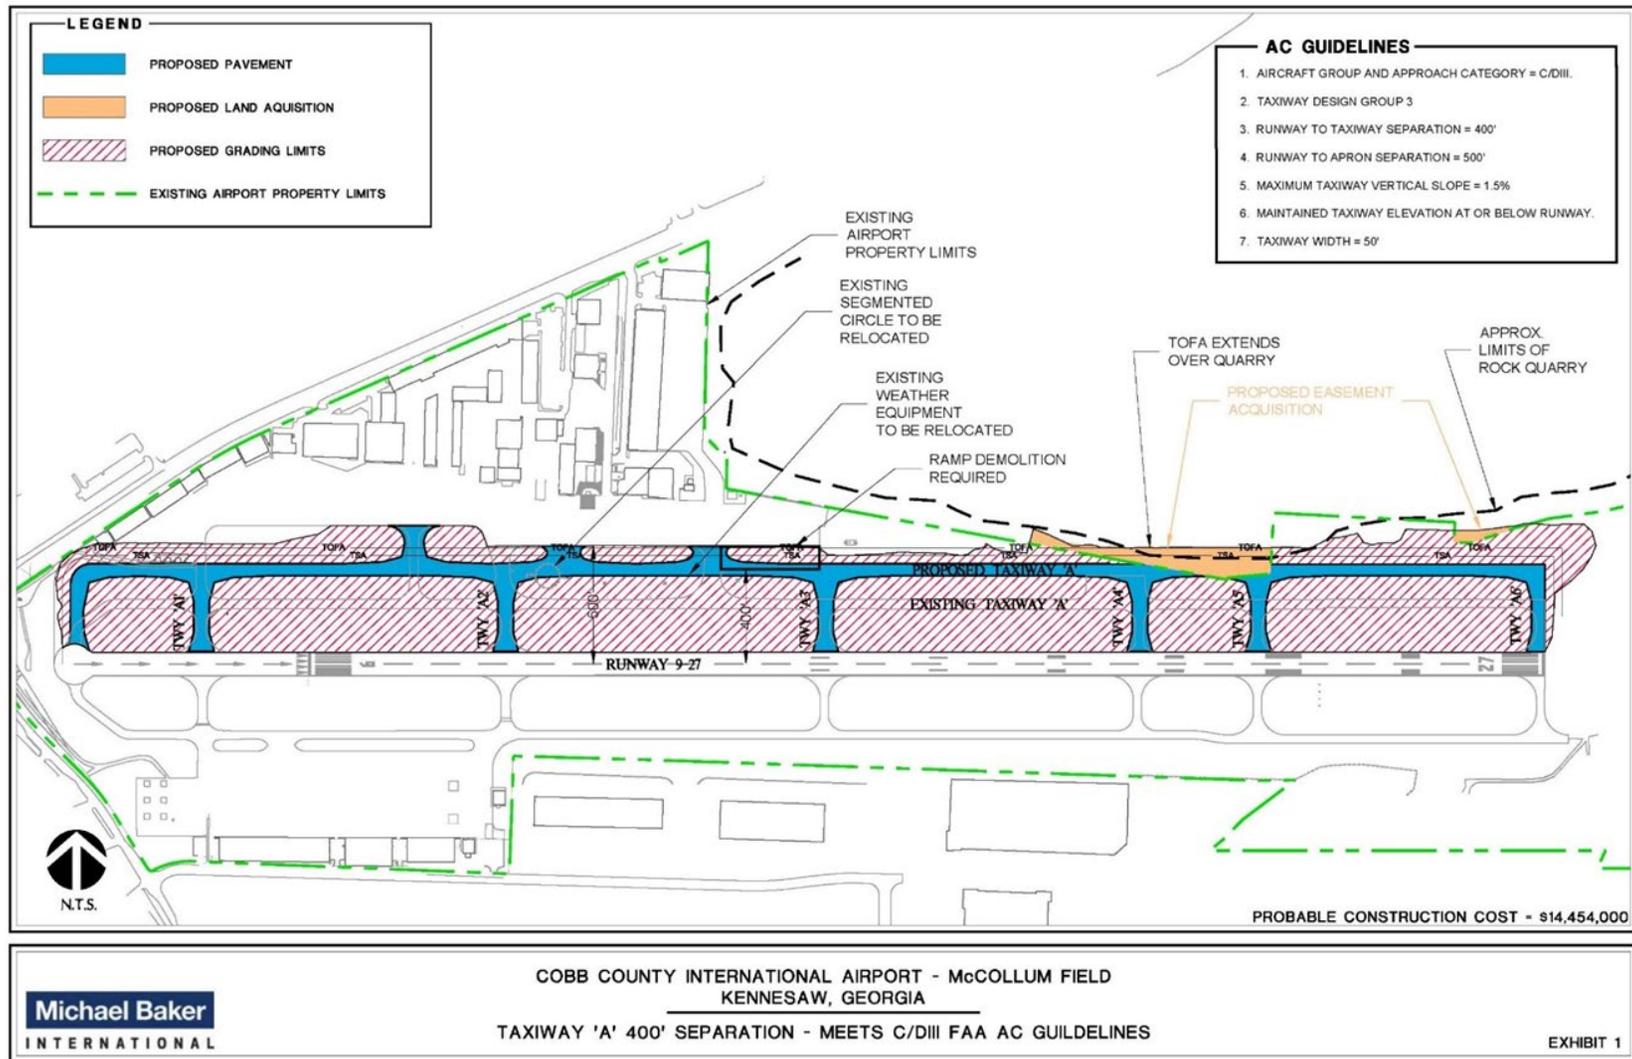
Taxiway ‘A’ Relocation, Alternative 1b (400-foot Runway/Taxiway Separation)
